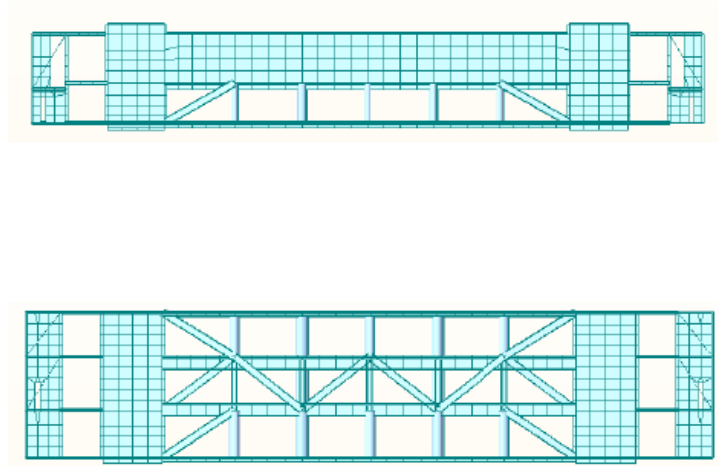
detail of the central steel belt beam and top reinforced concrete belt beam
